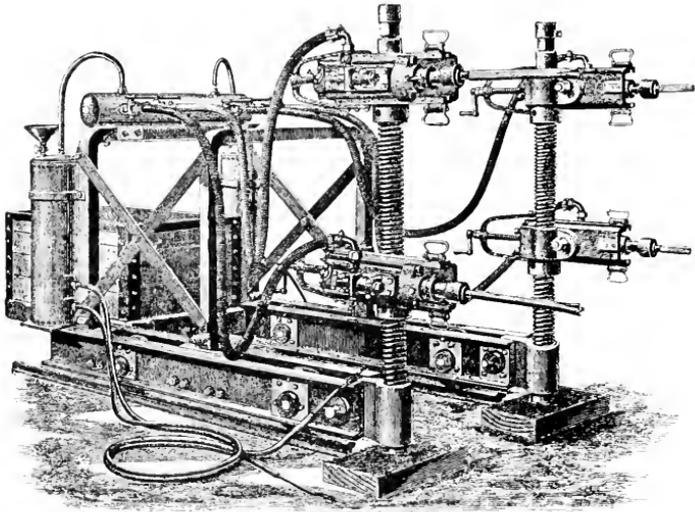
SCHRAM'S ROCK DRILL CARRIAGE.
